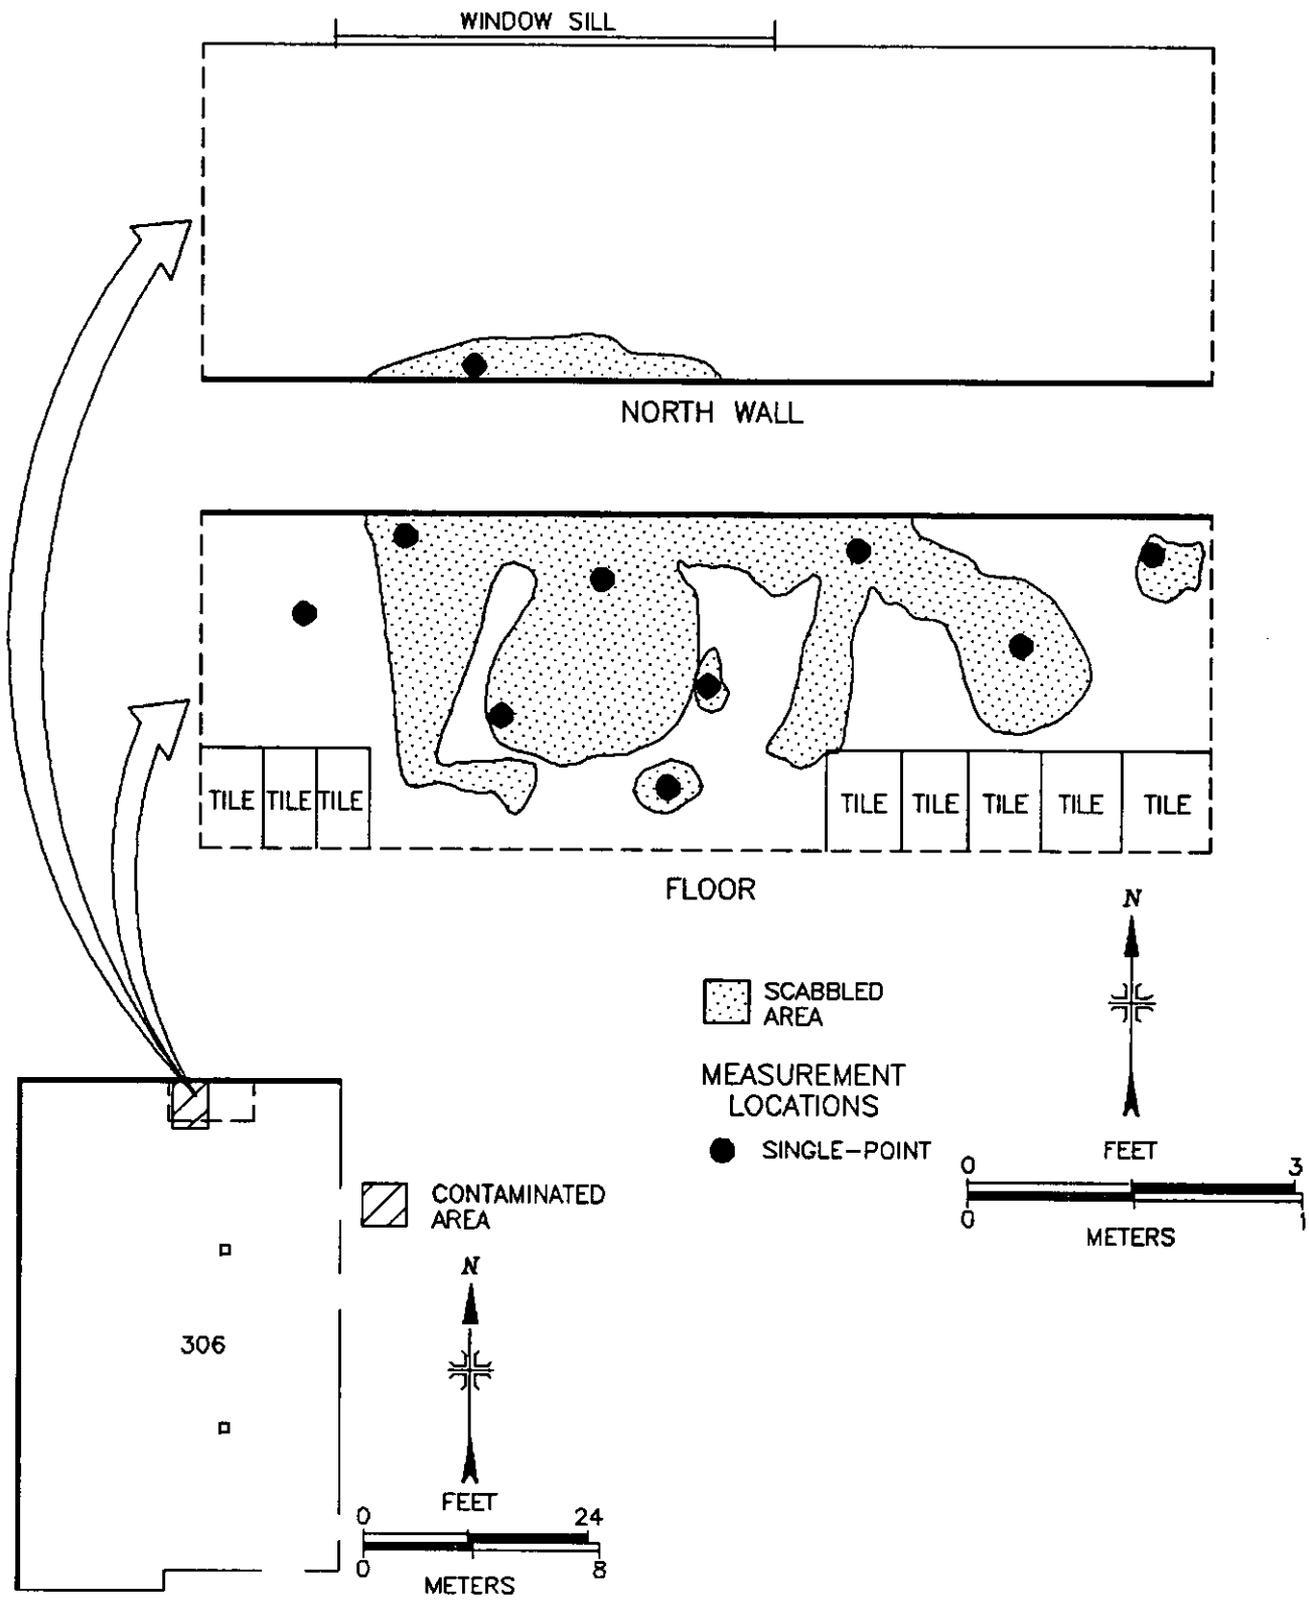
Building 1, Room 306, Indicating Measurement Locations on the Floor and North Wall
